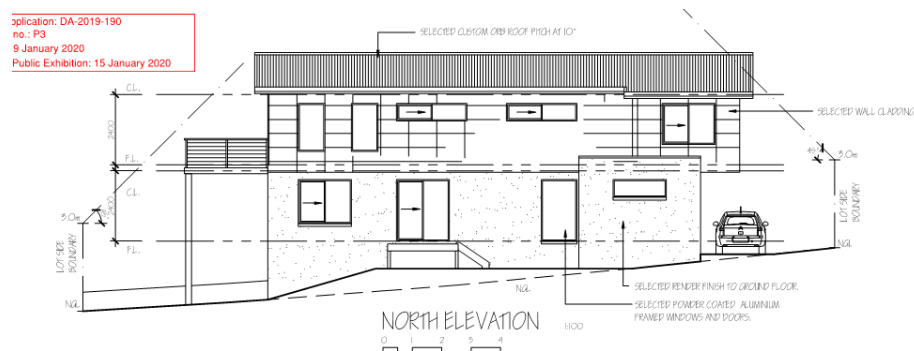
Northern elevation of proposed dwelling, as viewed from neighbouring property.
